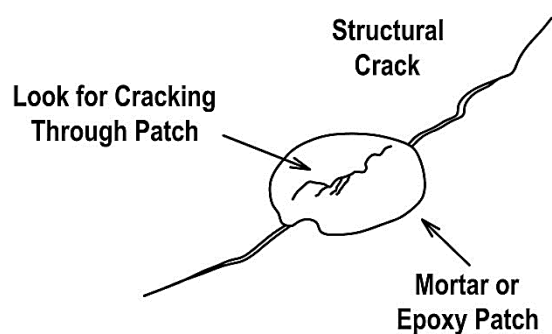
A simple epoxy patch used to monitor development of a structural crack in concrete
